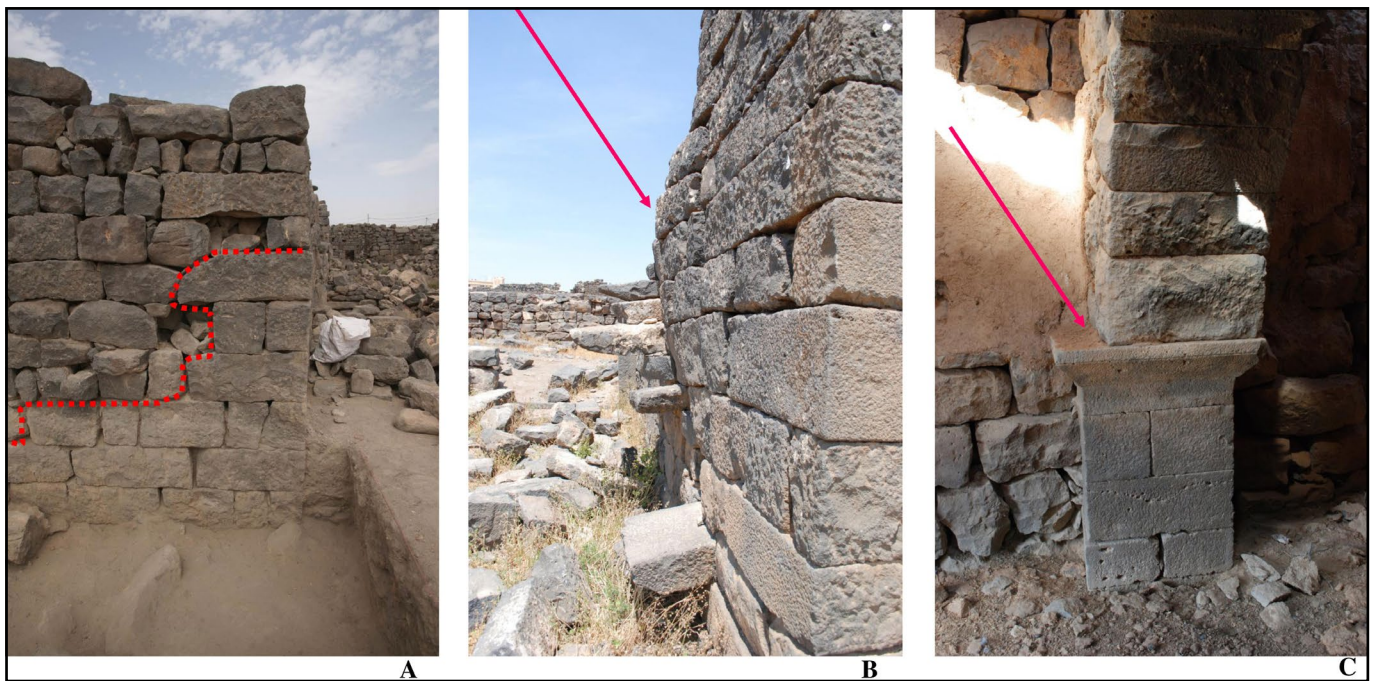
A: Collapse interface of the southern perimeter wall of TU 29.1; B: Bulging of a wall in TU28. C: Voussoirs that have been reset on the piers of an older arch (photos by Piero Gilento).
